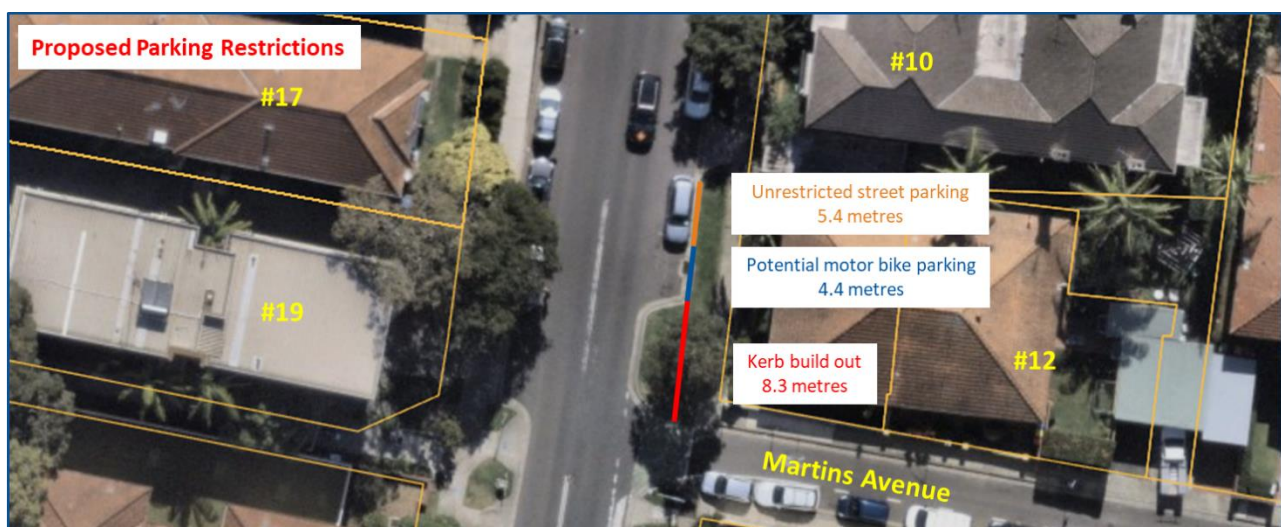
Proposed parking restrictions at the frontage of 12 Penkivil Street.
